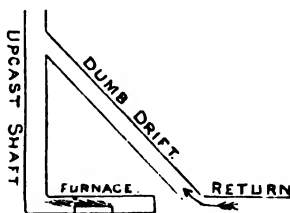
Arrangement of Dumb Drift at bottom of Upcast Shaft to prevent Return Air passing over Furnace
